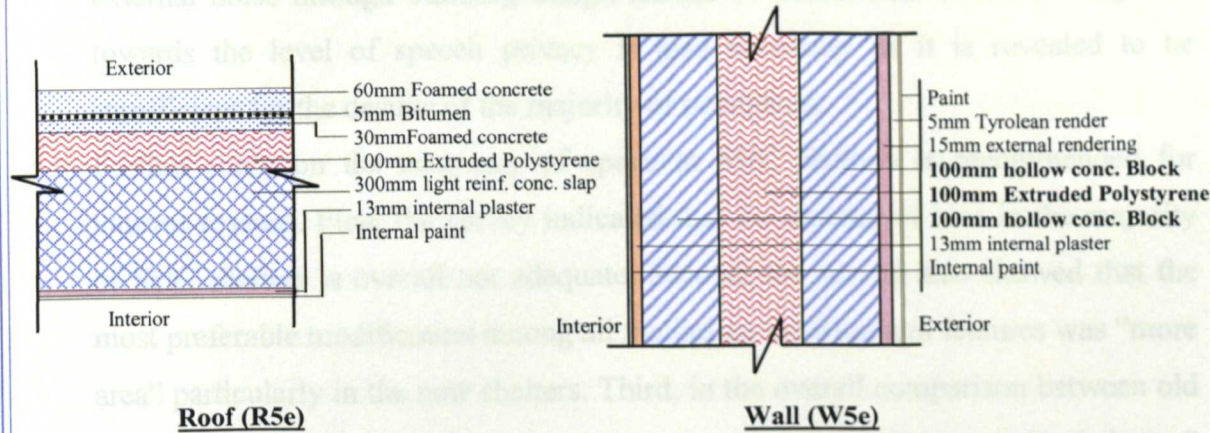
Detail drawings and potential improvement of the recommended fabrics combinations C1 and C6 to C10.
